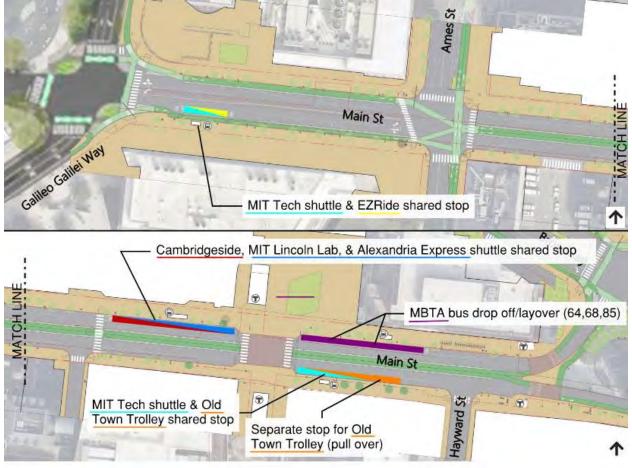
Proposed Public and Private Transit Stops Along Main Street
